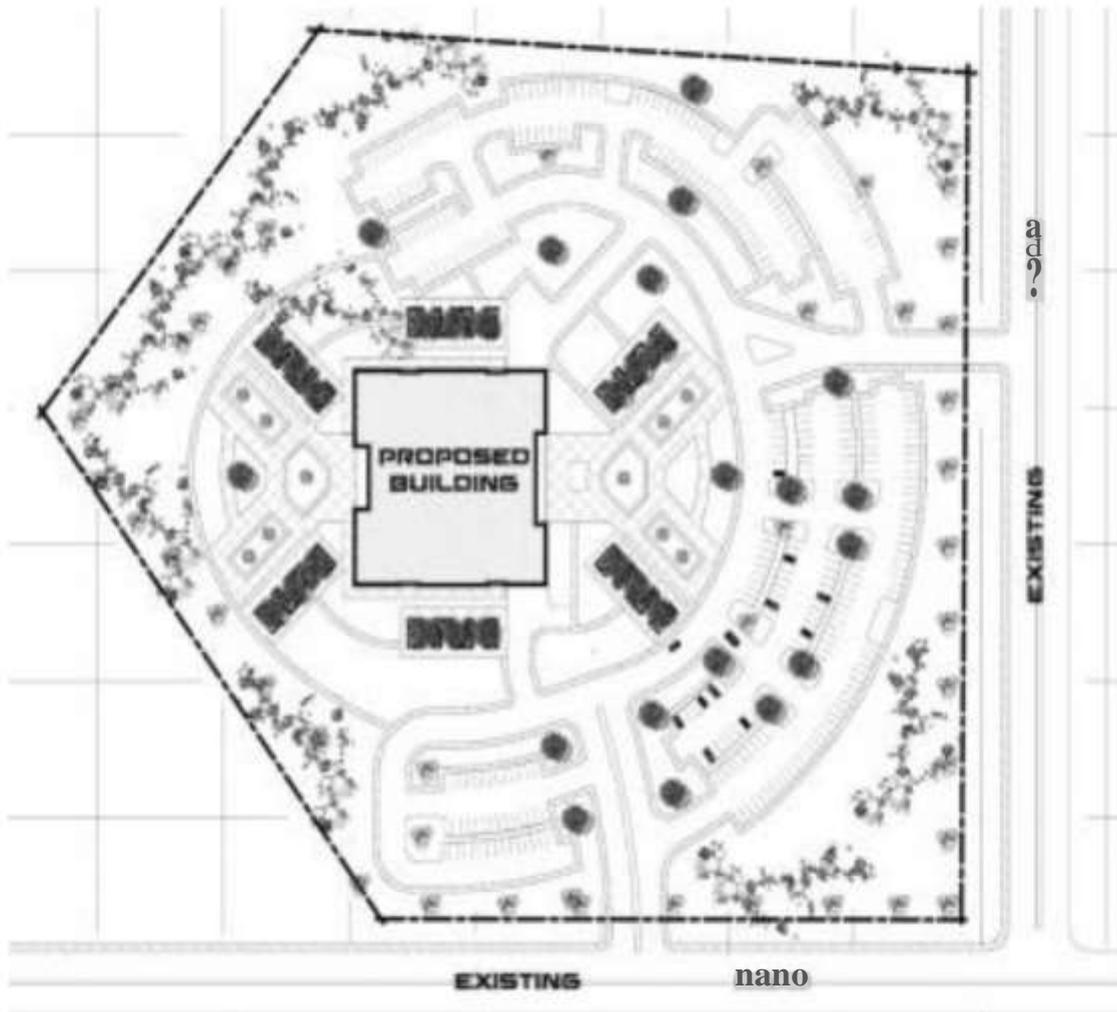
Site Plan Showing Orientation of Building and General Landscape Layout (Source: Researchers, 2018)
